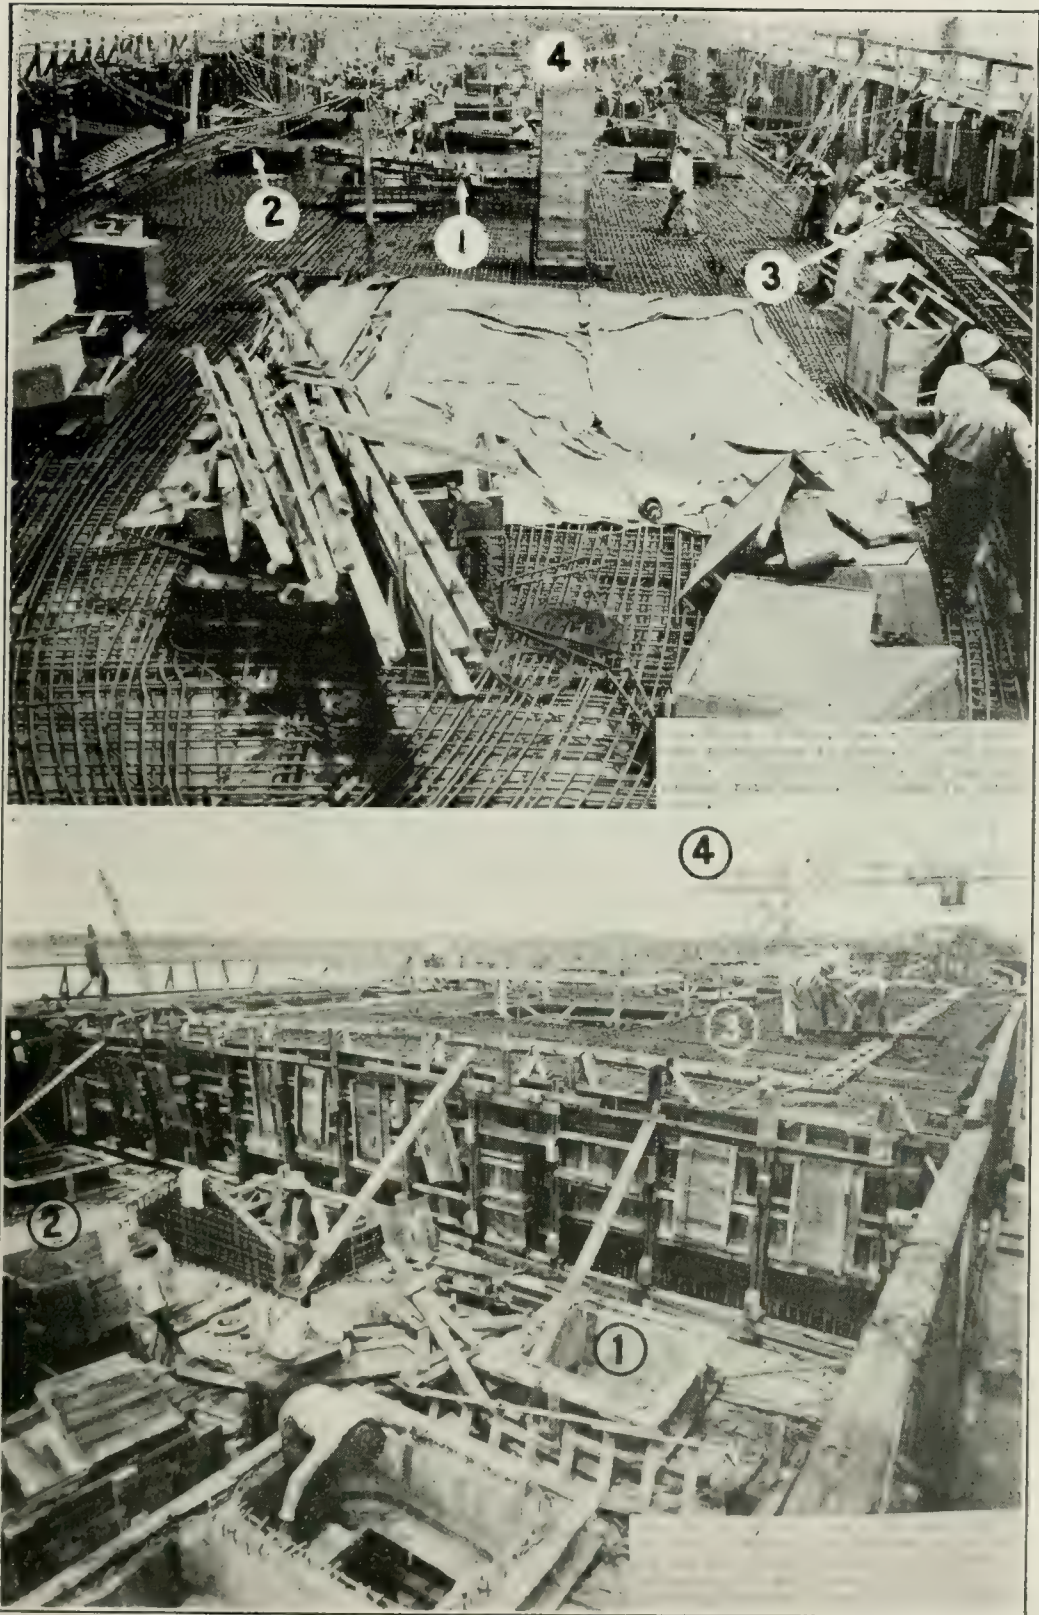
REINFORCING STEEL PLACED IN THE BULWARKS AND DECK HOUSES.
